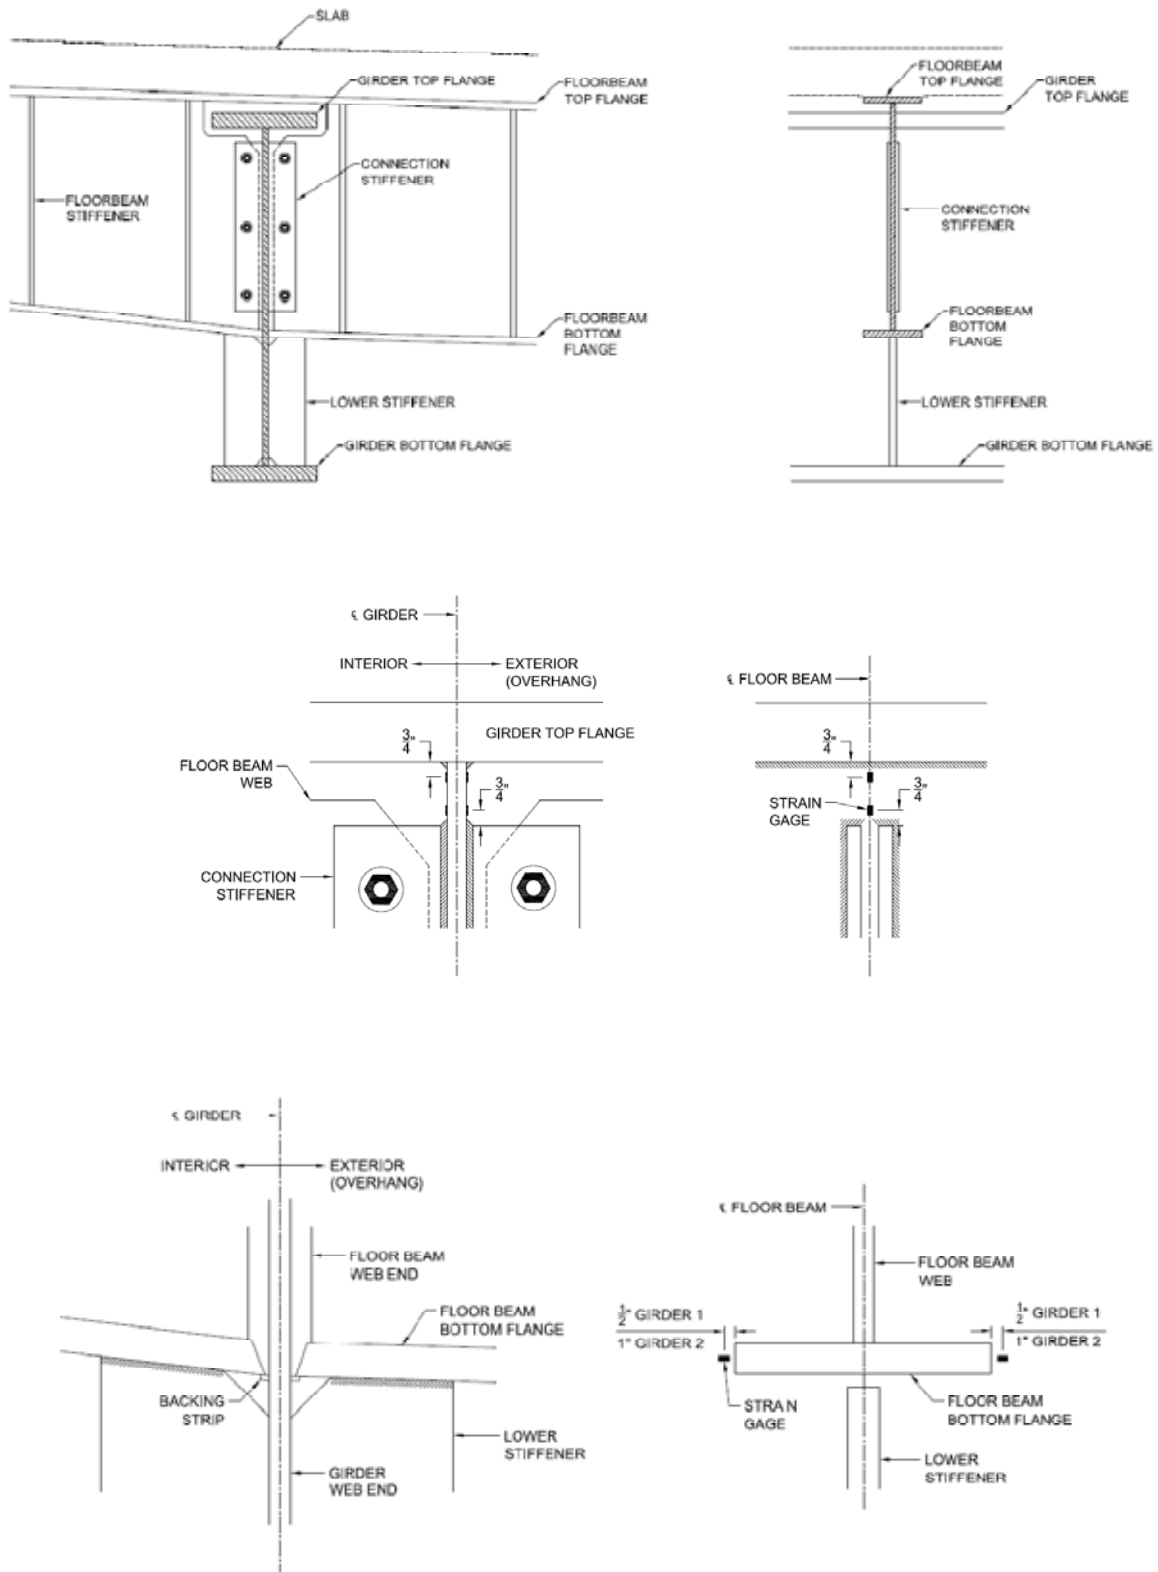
Section F14N Floor Beam Two Connection Detail and Strain Gage Locations
